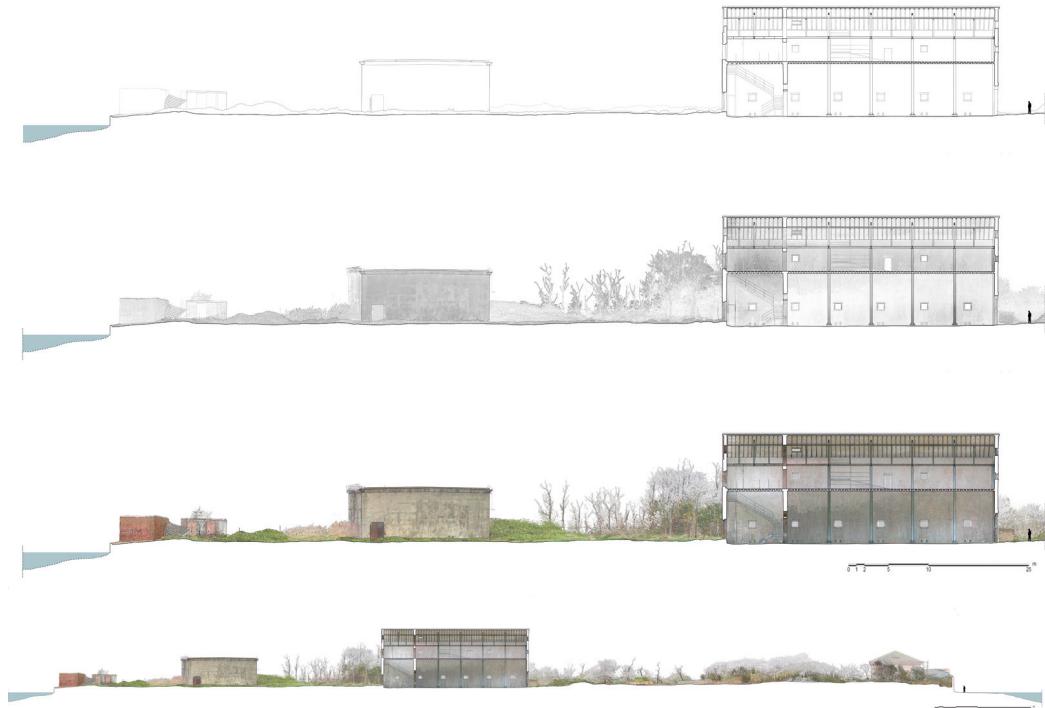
Longitudinal section and drawing detail wireframe and with overlays point cloud and orthoimage.
